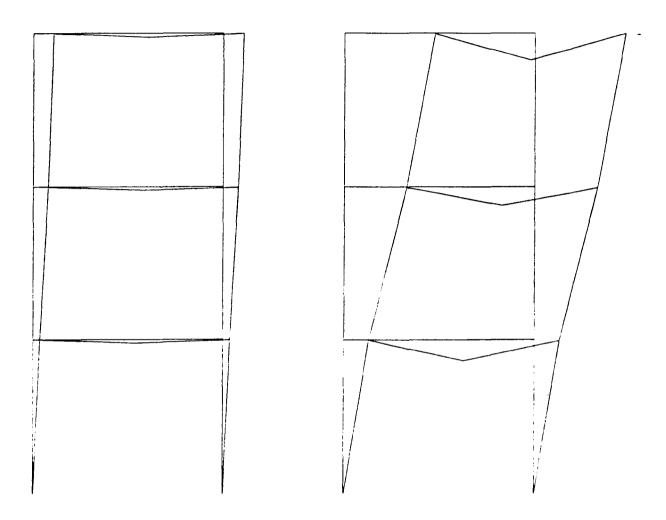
DEFLECTED SHAPE OF FRAME A TYPE 1 LOADING, SCALE 1cm TO 10cm
